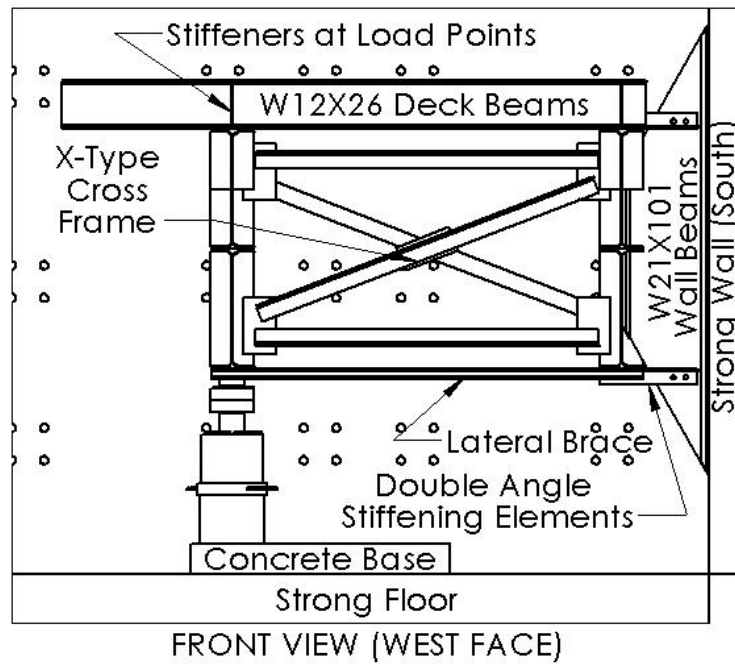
Front View of Cross Frame Fatigue Setup (Details)
